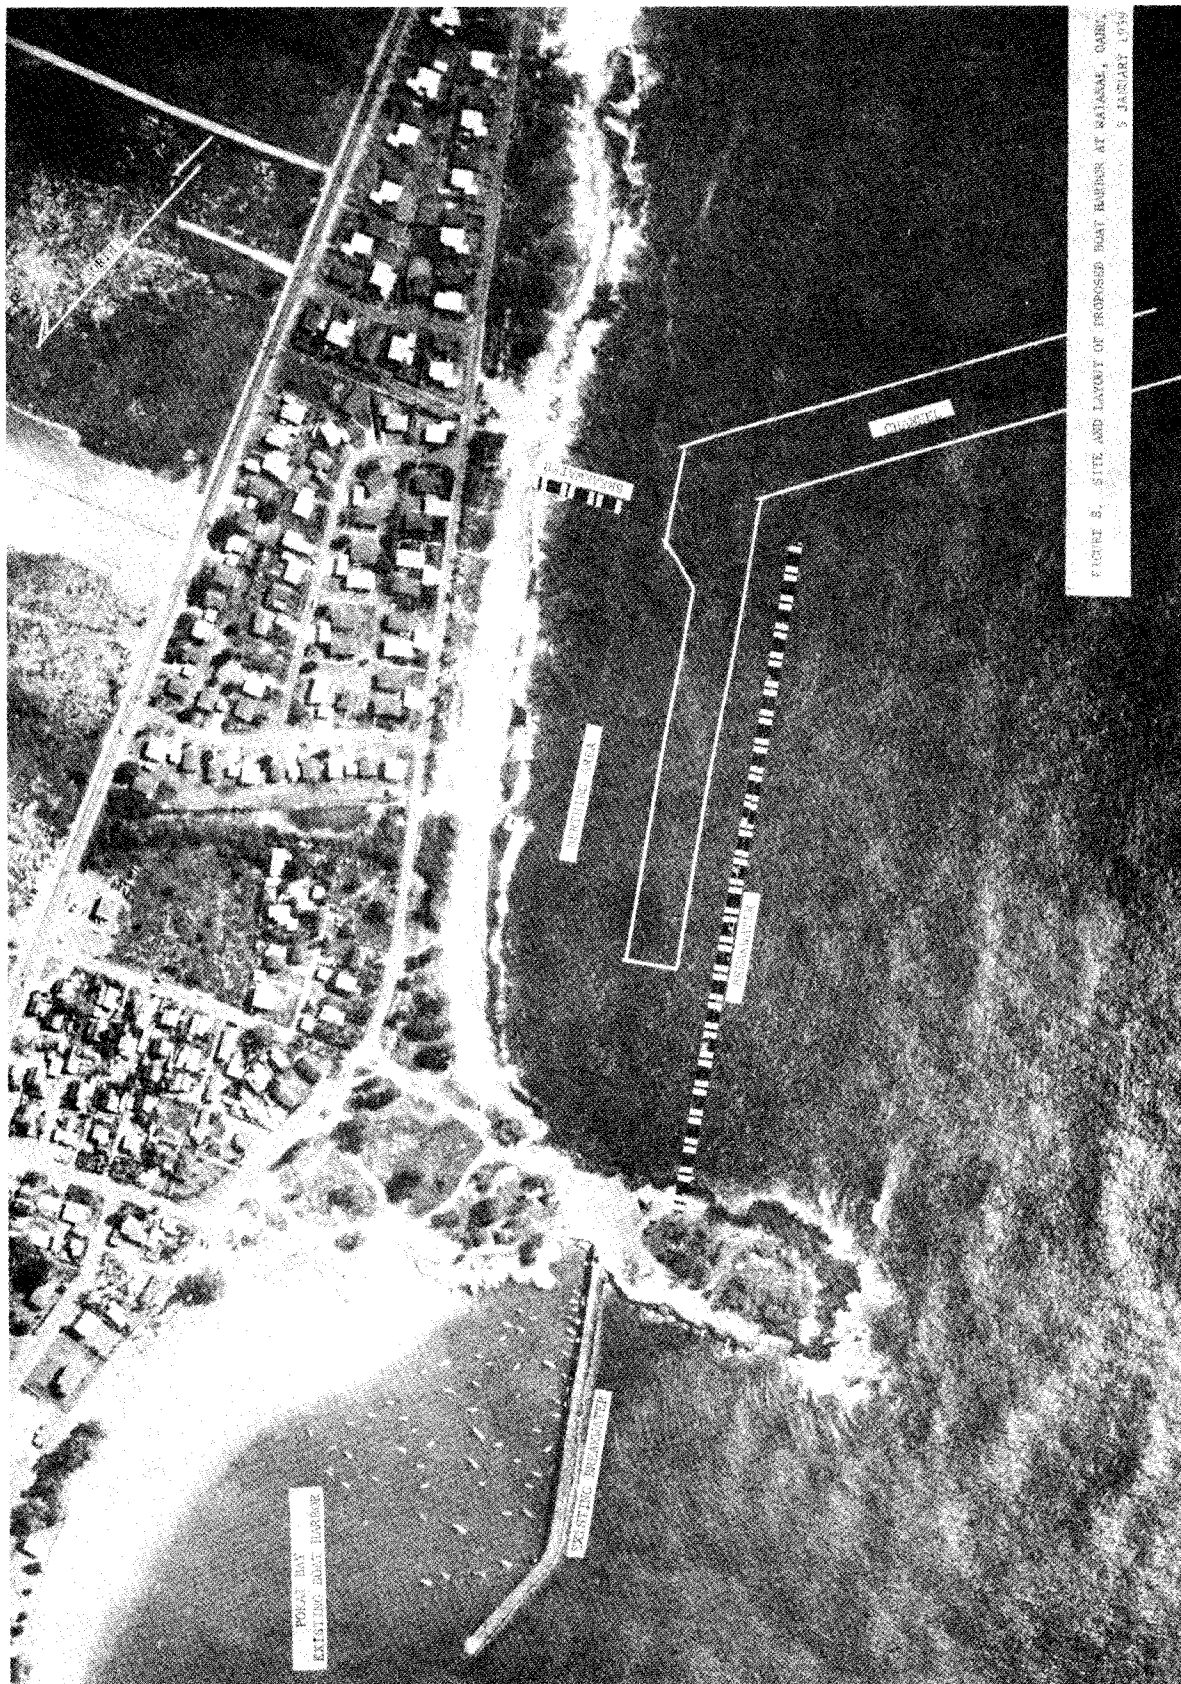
SITE AND LAYOUT OF PROPOSED BOAT HARBOR AT POKAI BAY, OAHU,
